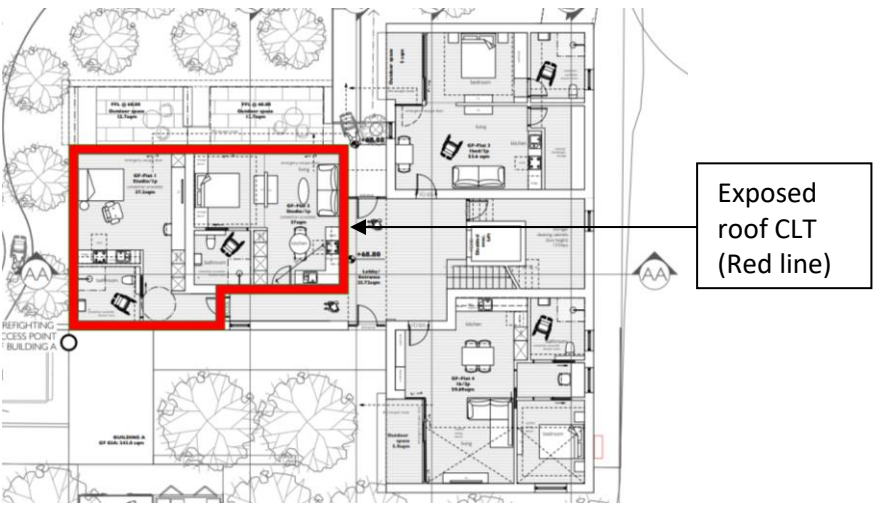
Exposed CLT for Block A (Ground Floor)
